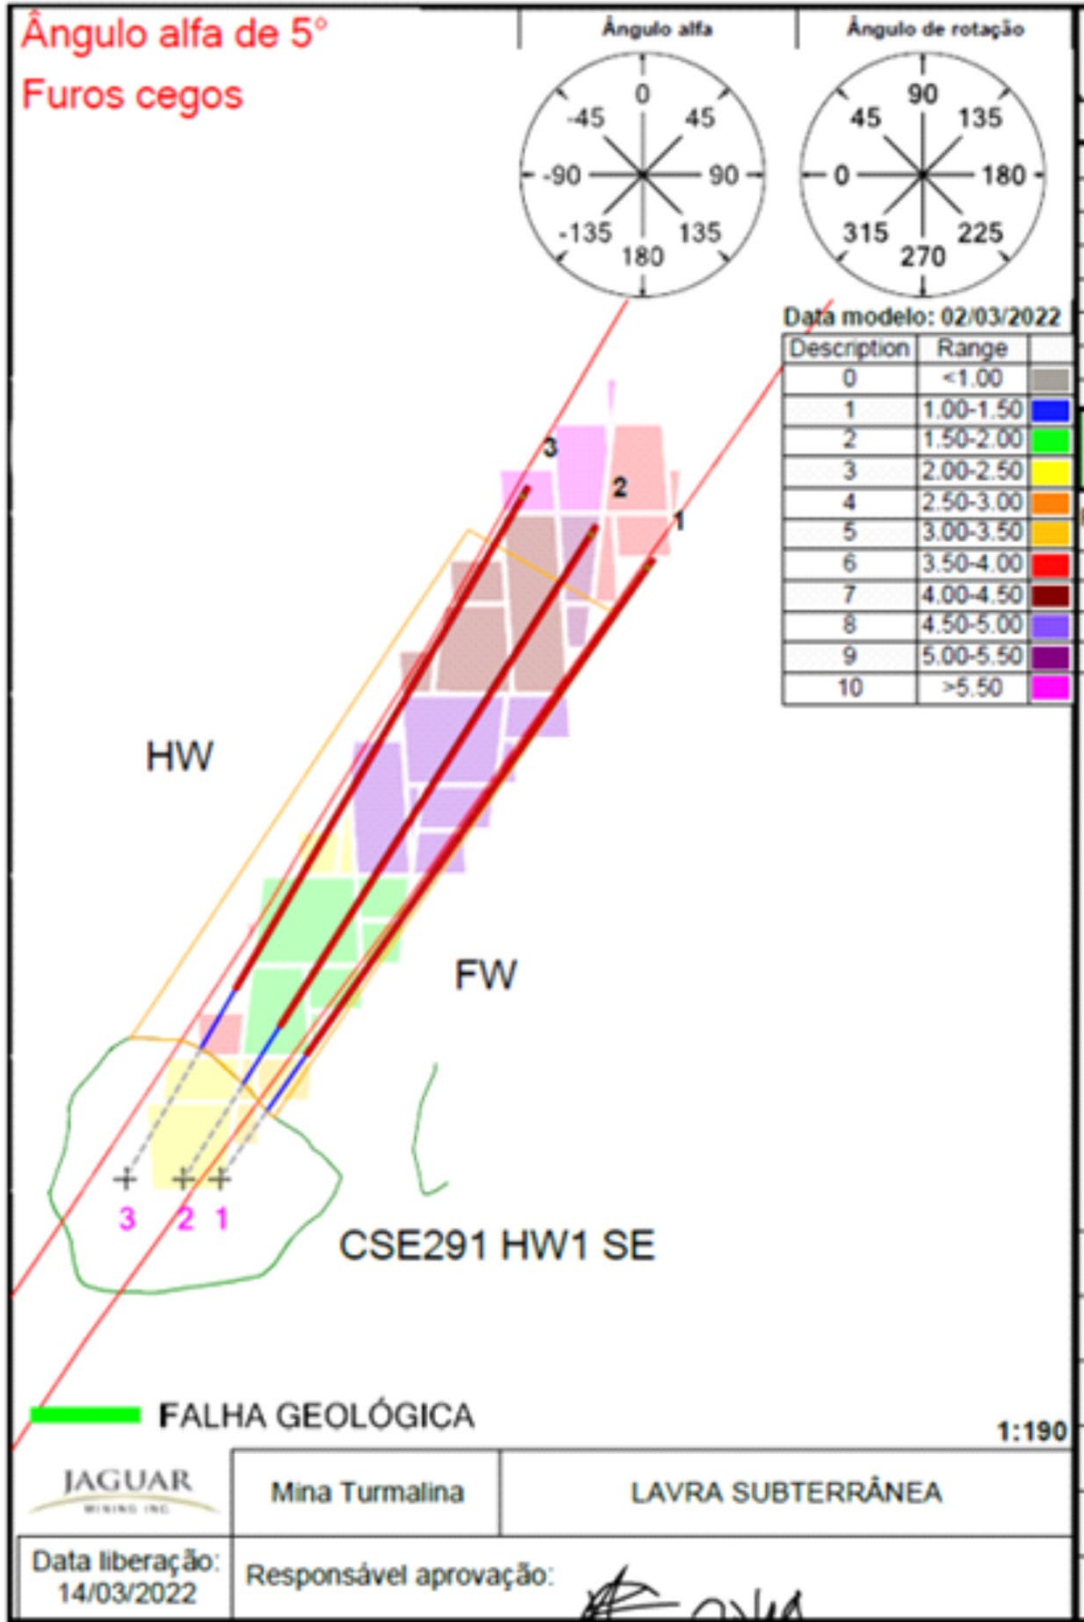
Cross Section Showing Longhole Fan with Longitudinal SLOS
